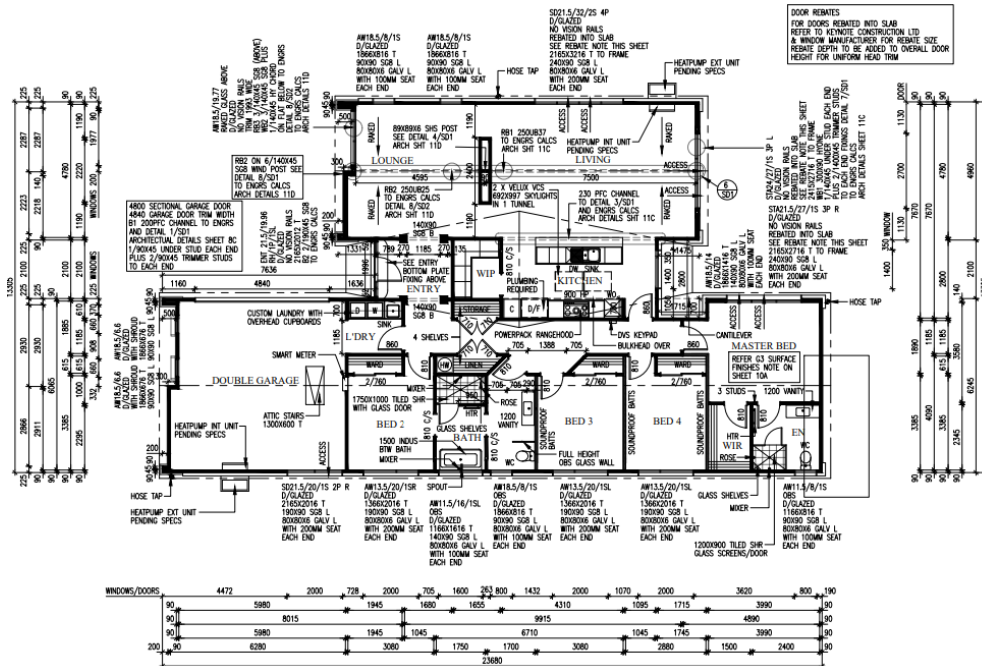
Proposed floor plan (Source: Platinum Homes)
